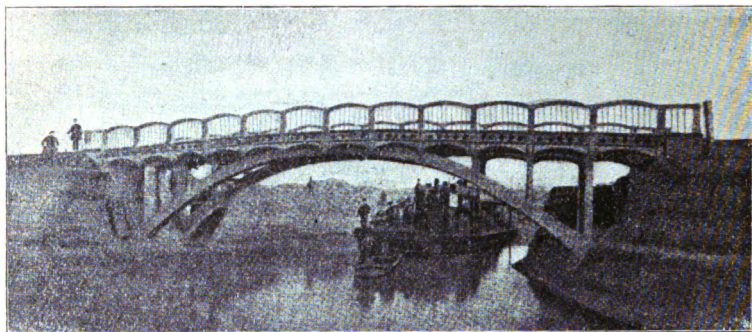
Arched Bridge of 60 ft. span. Ribs support by means of spandrel columns, the reinforced concrete roadway; railings consist of reinforced concrete posts and arches.
